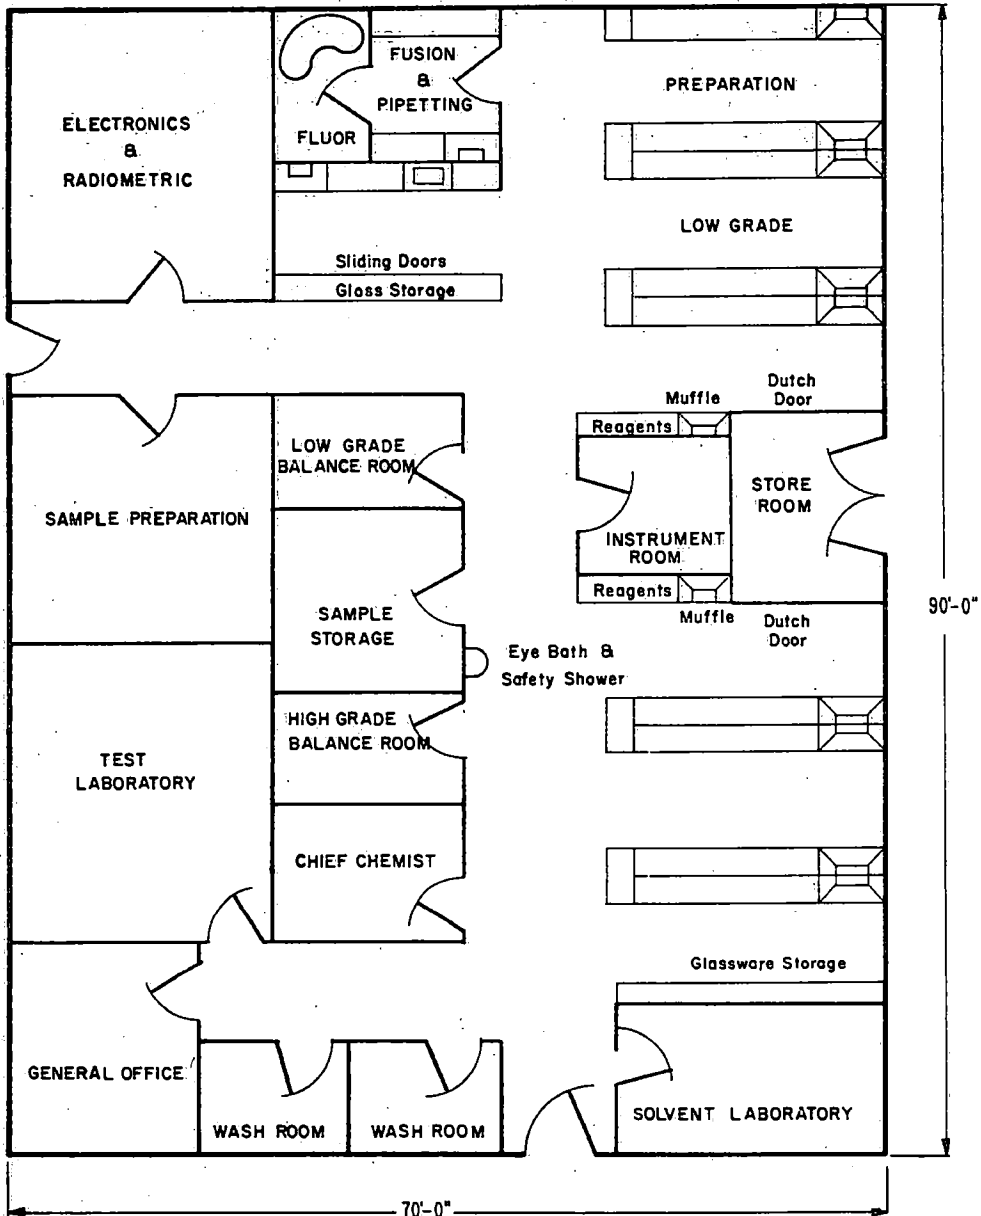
SUITABLE FLOOR PLAN FOR LABORATORY BUILDING.
